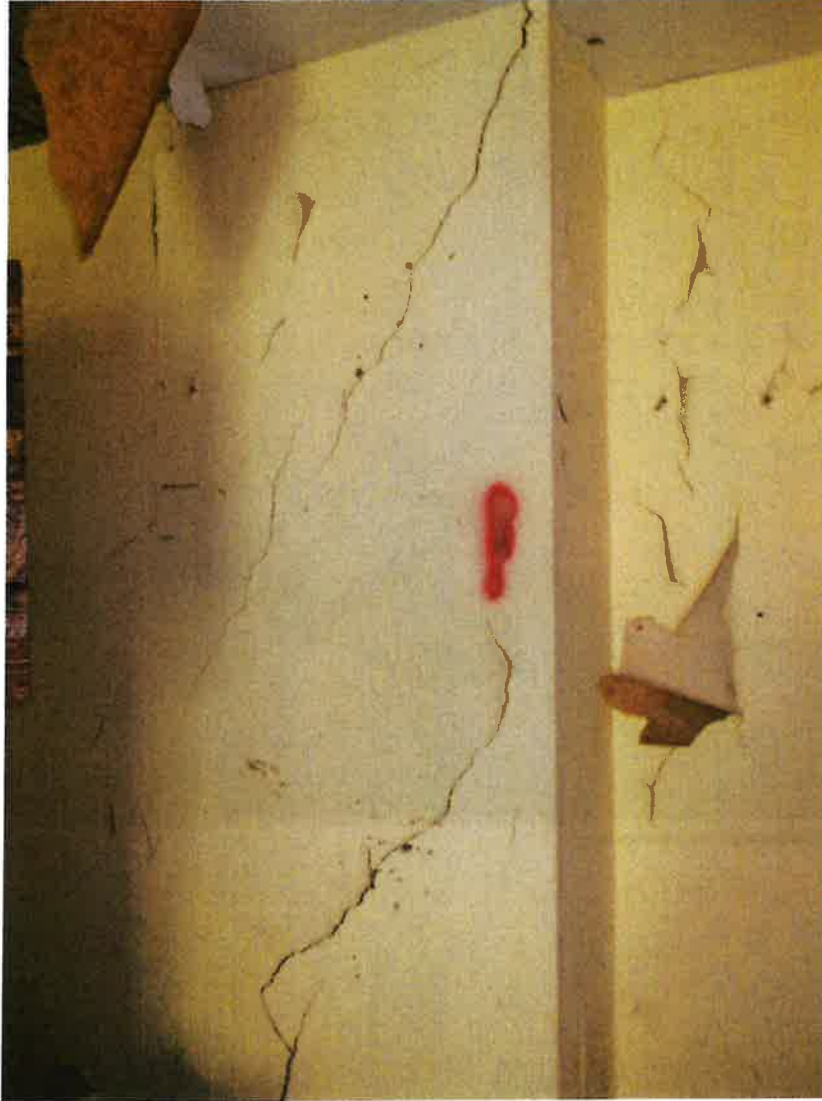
Diagonal plaster cracks at interior of chimney.
